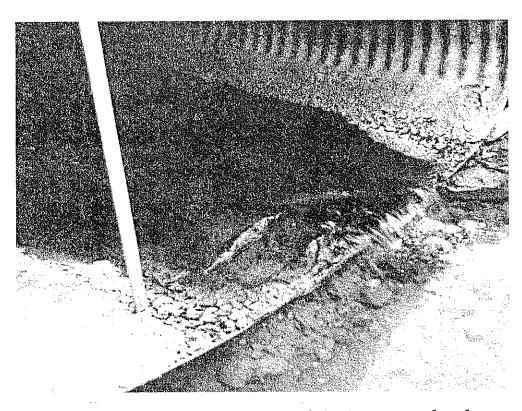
Scaling along the edges of the low water level or "trickle line" in the paved invert of a 72x44-in. pipe arch installed in 1949. This condition extended throughout the entire length of the culvert. underlying bituminous material. Still there were indications that the deterioration might be appreciably progressive with time, and that scaling does encourage failure of the underlying pavement. There were some locations where the dry scales had hardened enough to become brittle, and undoubtedly they could be broken off by the scouring action of silt and debris.
